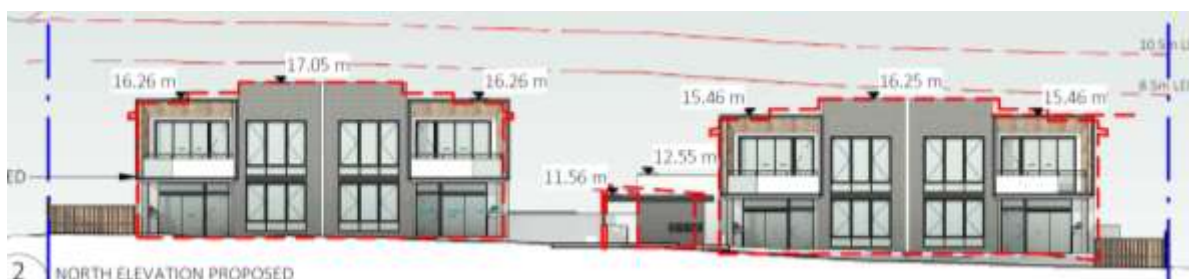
Proposed north elevation with outline of consented elevation indicated in dashed red line
